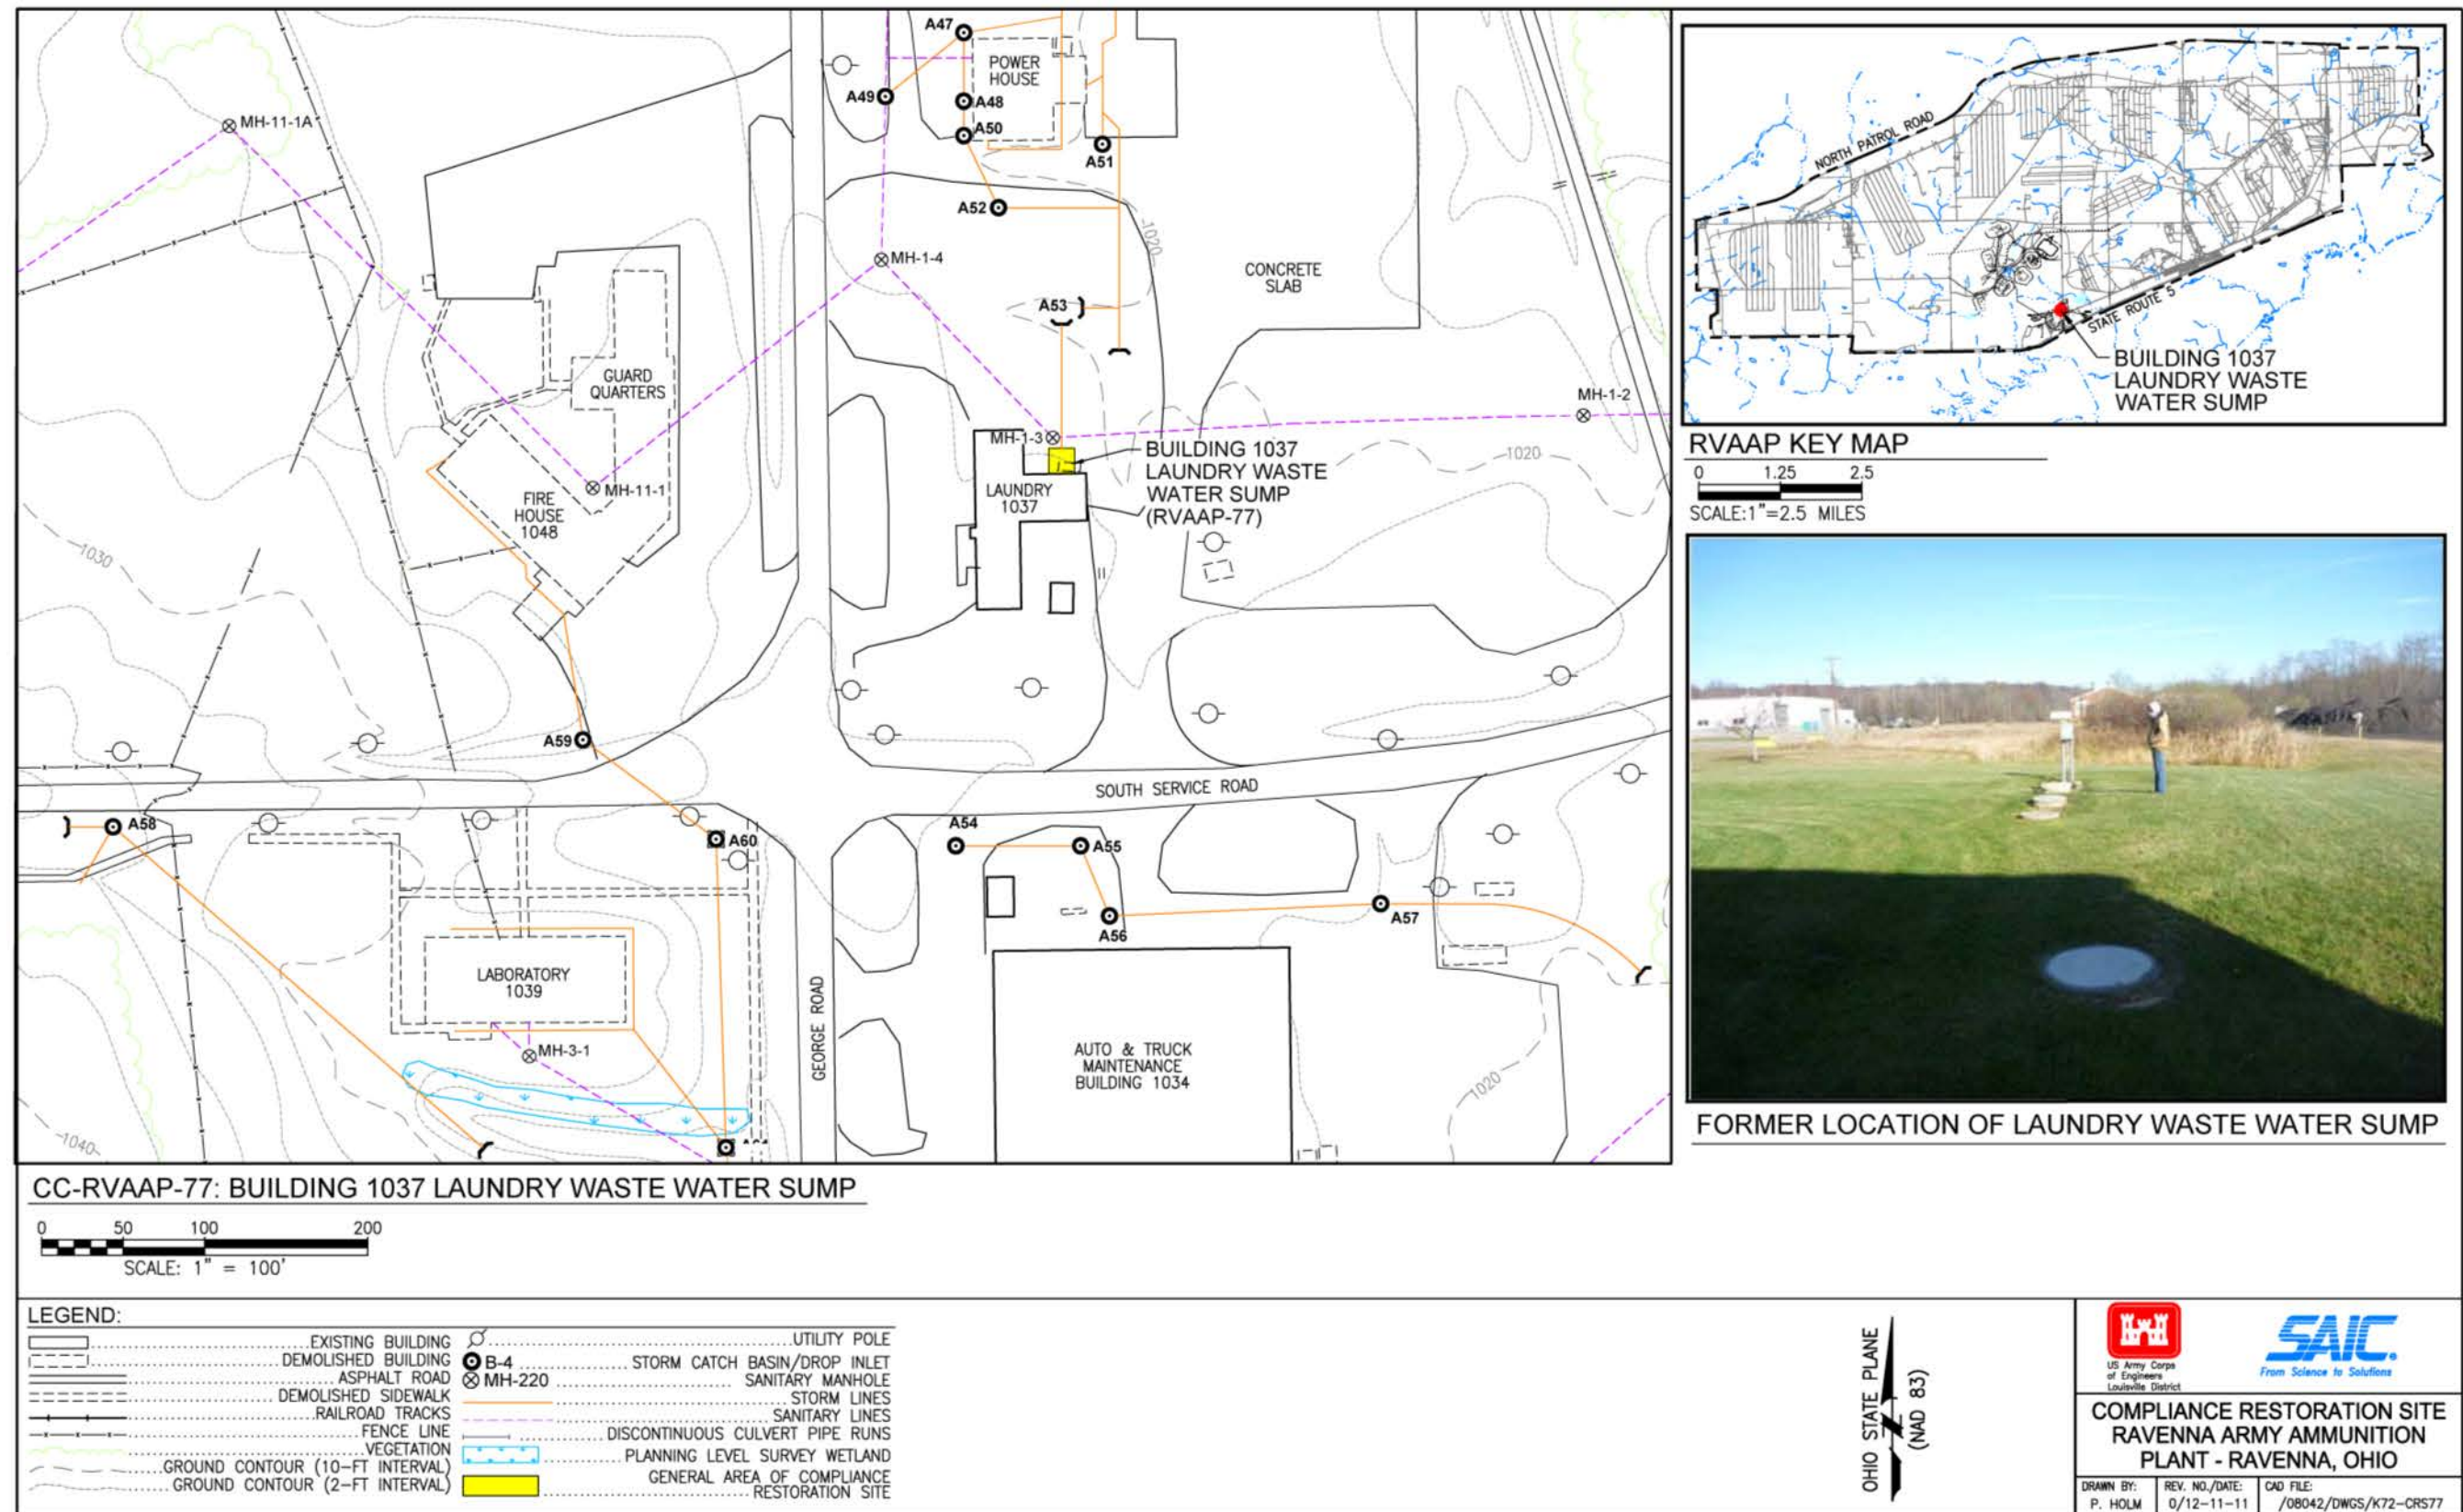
Building 1037 - Laundry Waste Water Sump Map and Site Features
